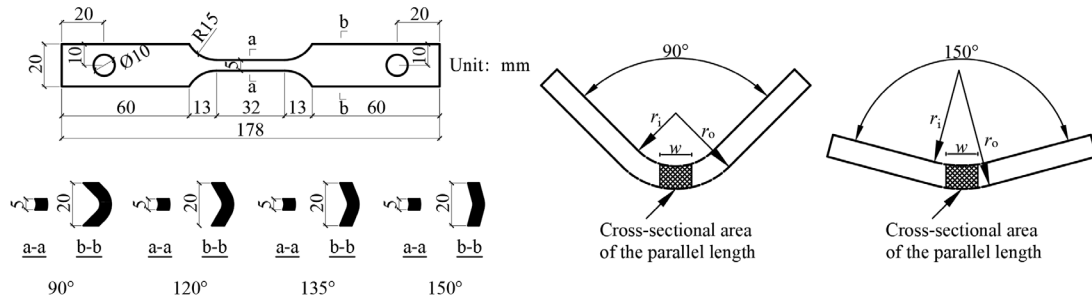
Dimensions and cross-sectional geometries of the corner coupon.
